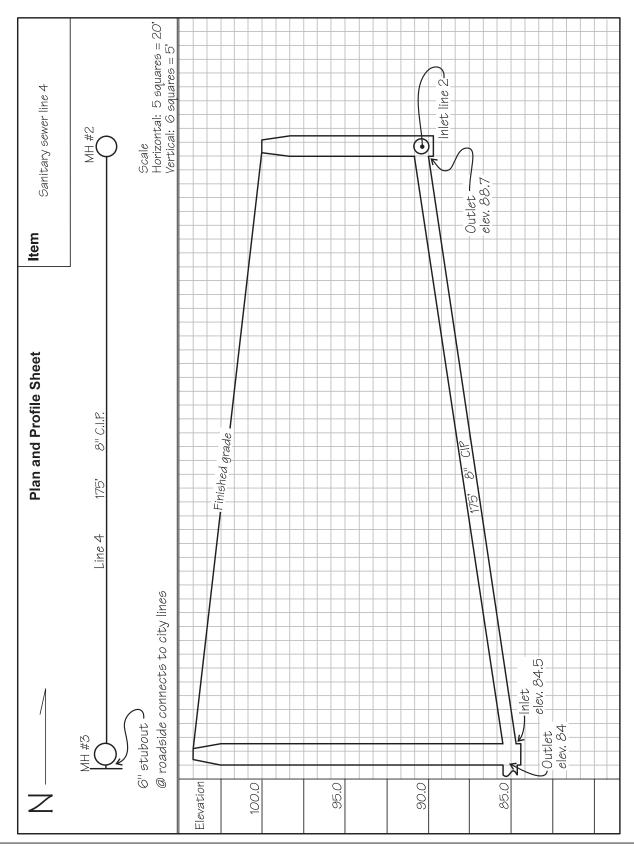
Sanitary sewer line 4, plan and profile sheet
